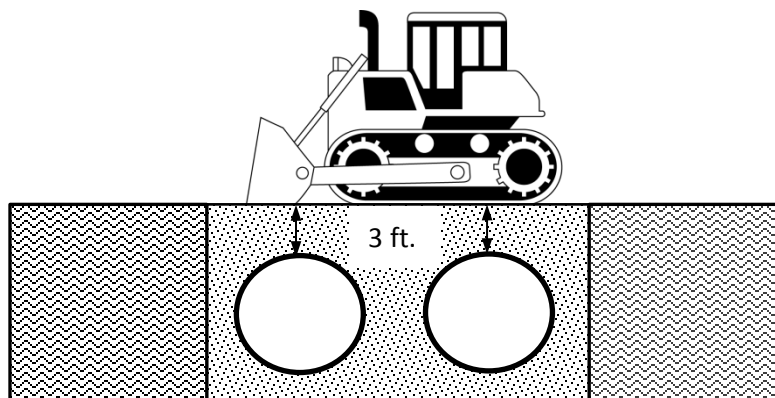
Minimum Cover to Allow Construction Traffic over Pipe
